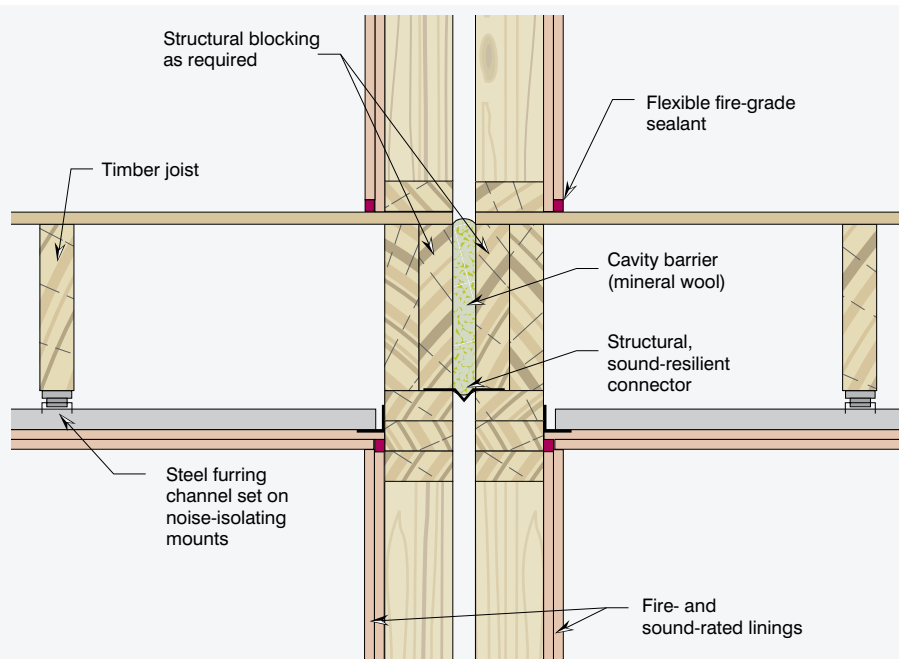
Discontinuous floor joist and floor sheeting – elevation view.
